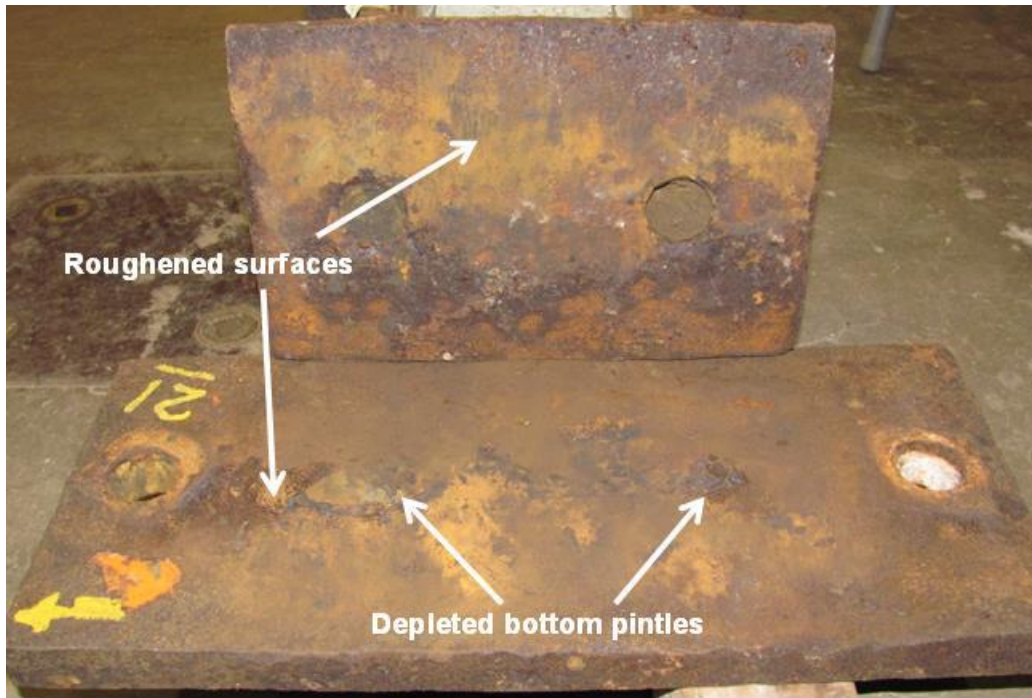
Cleaned bottom contact surfaces of Bearing AR21
